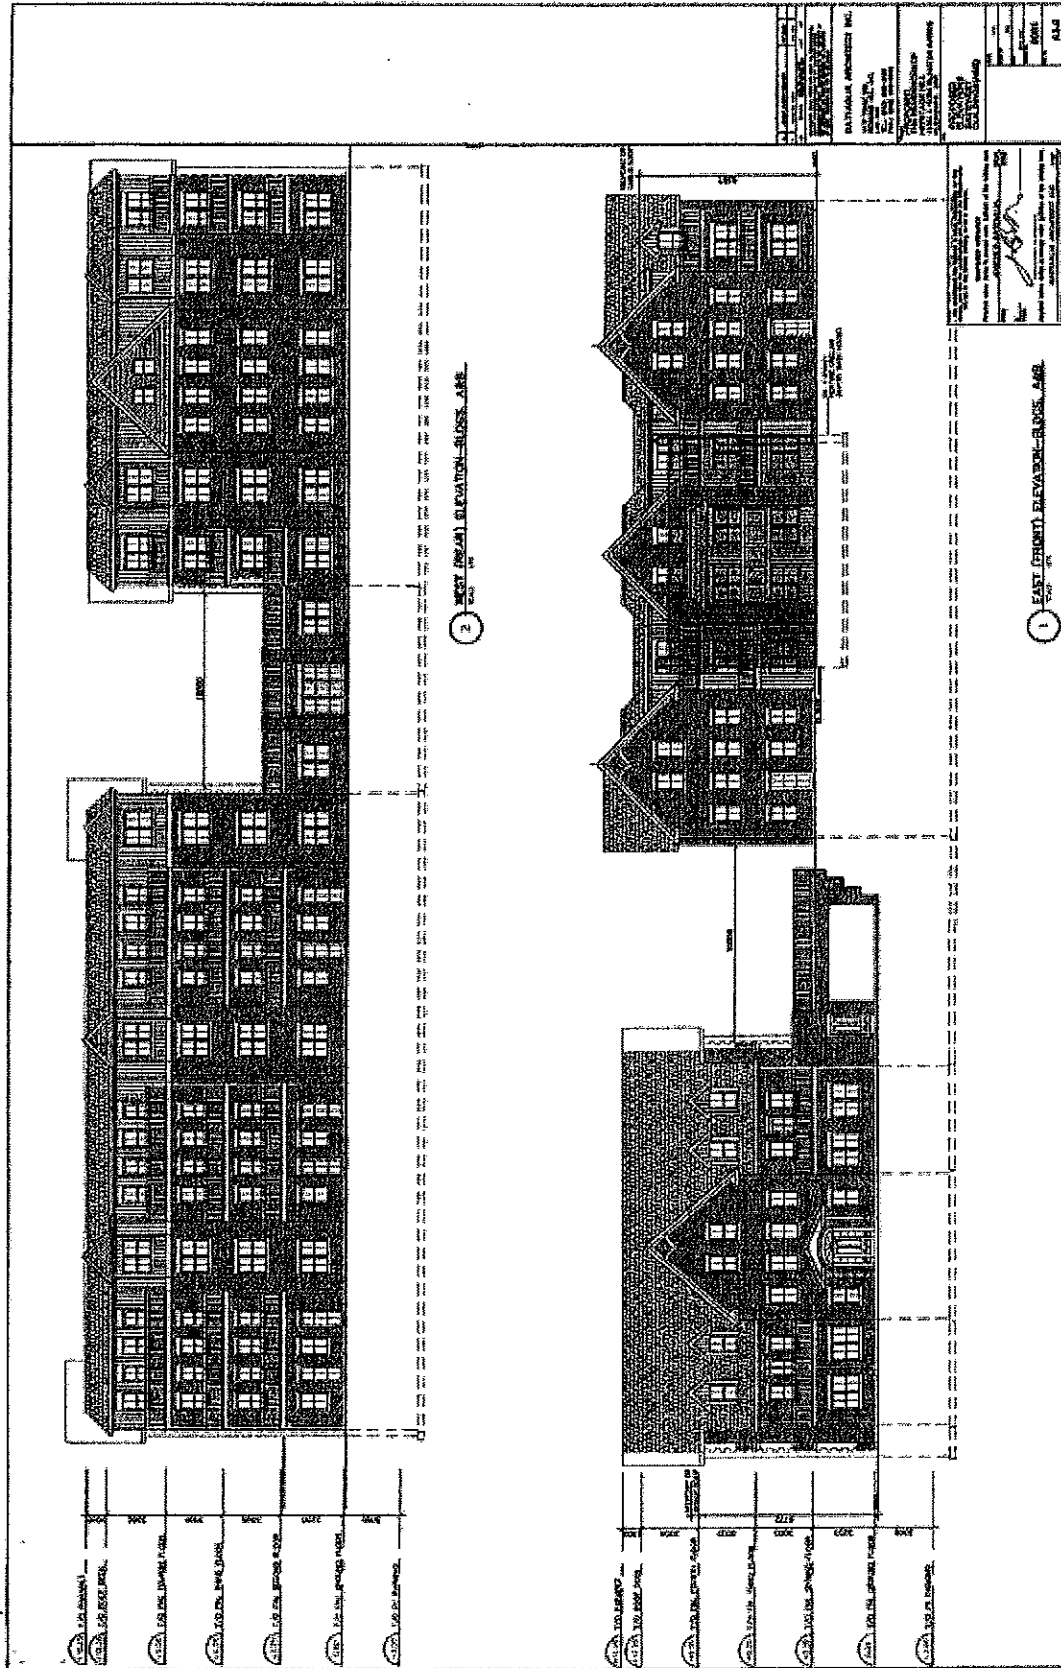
Proposed Front and Rear Elevations (28 November 2008)
